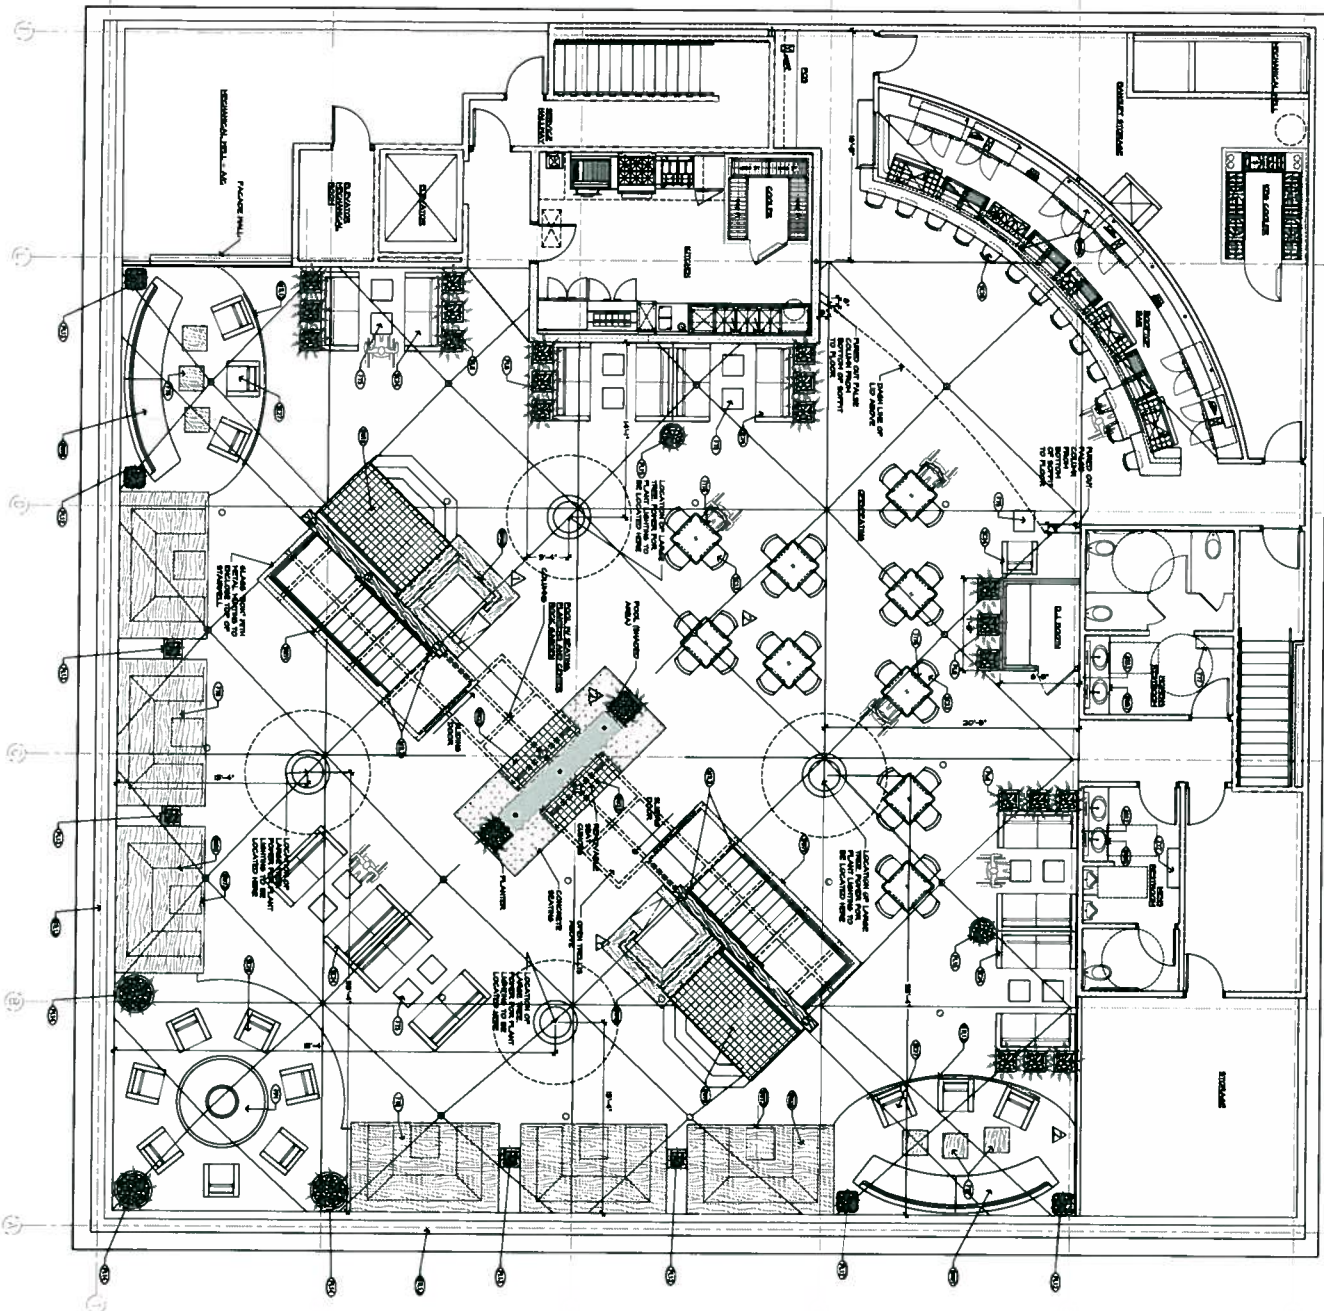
FIGURE EQUIPMENT FLOOR PLAN - ROOFTOP LEVEL
